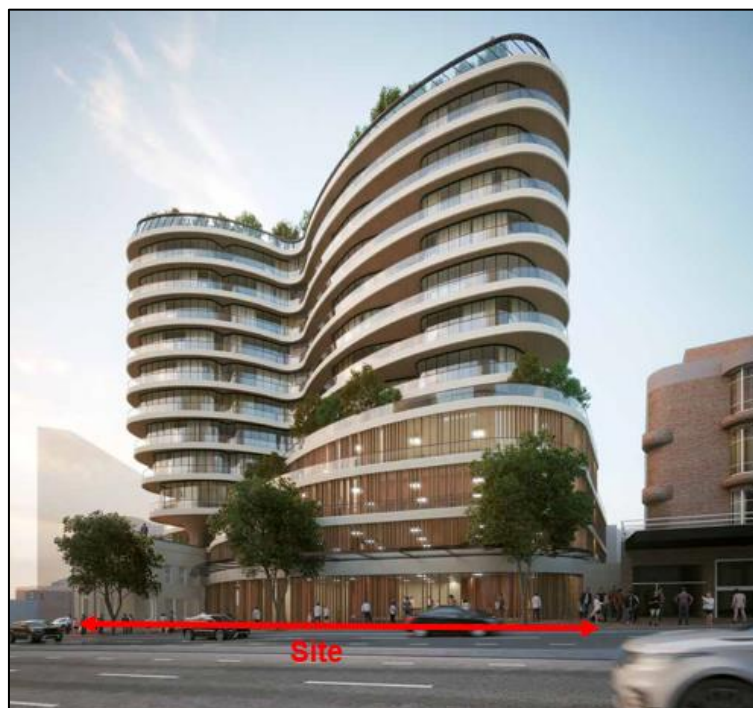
Indicative Concept Design for 136-148 New South Head Road (Source: Group GSA)
